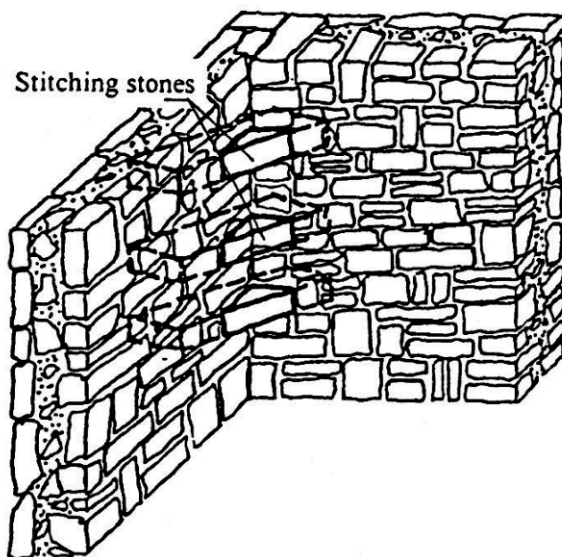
Strengthening of the corner zone of a stone-masonry wall with stone stitching [21]
